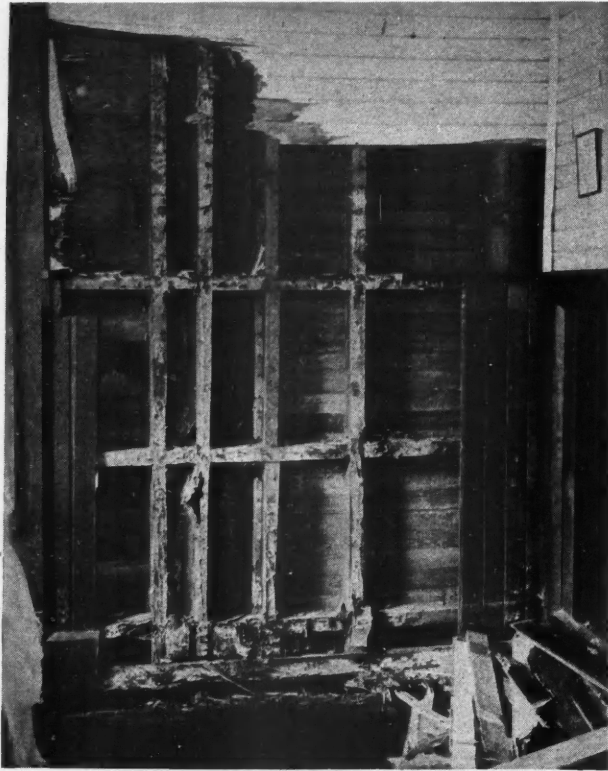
The Wainscoting on This Wall Appeared Sound, but When Most of the Wainscoting and Some of the Ceiling Was Removed the Fungus Extended Up the Studding About 6½ Feet. It entered the building by means of a small strip of lumber which extended from the ground into the wall.
